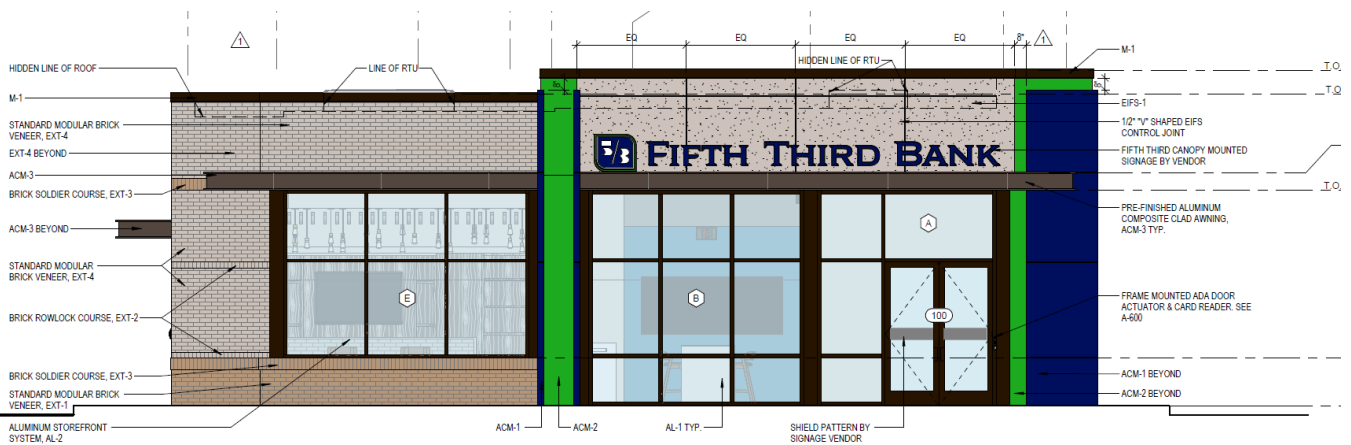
Lavista Road Elevation with 46.7% Fenestration.
